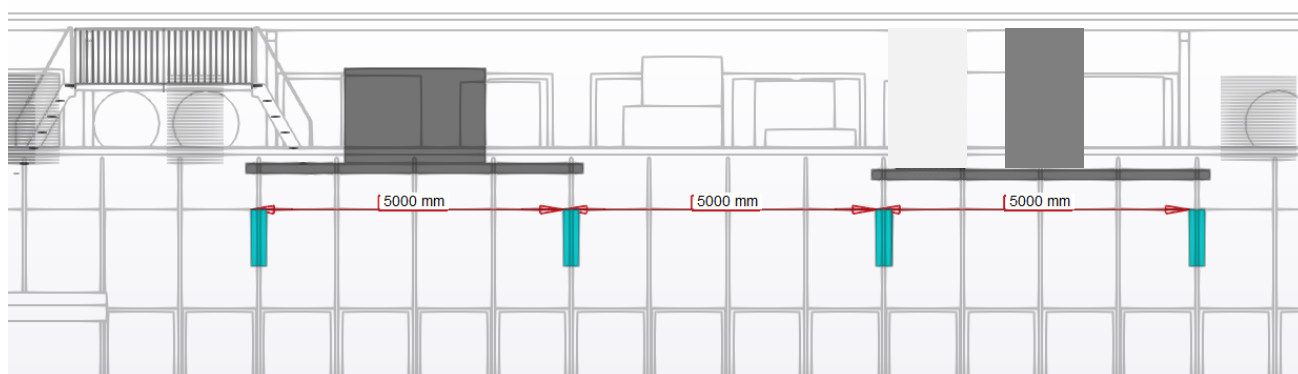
Elevation view of the heaviest new units and the affected prestressed beams.
